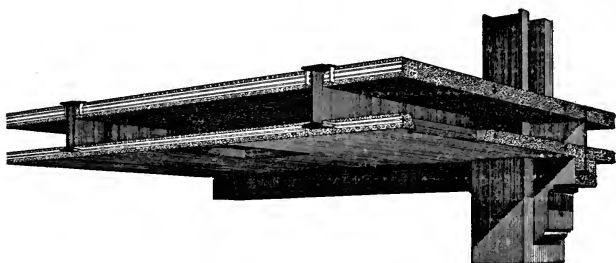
Columbian "Flat-ceiling" Floor Construction.
